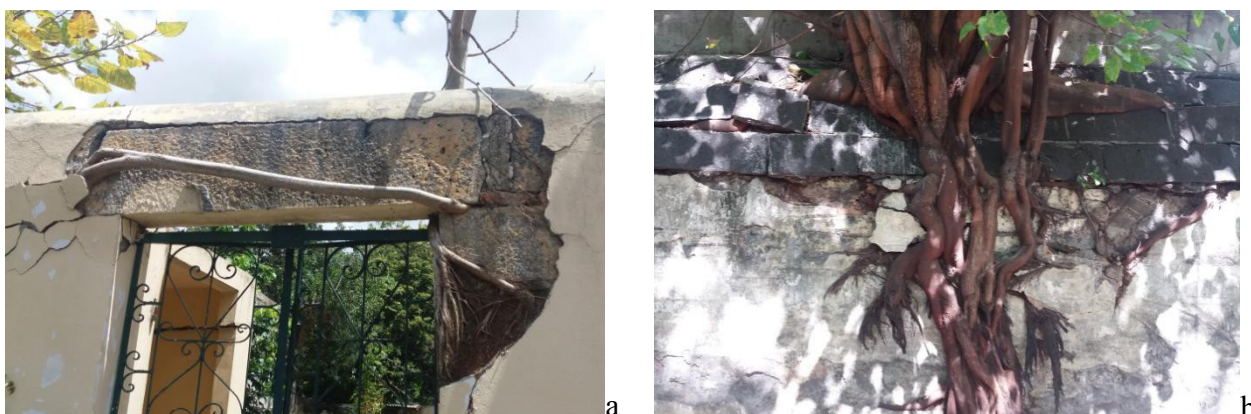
Damages by *Ficus religiosa*: 5a) Wall of a residential building in vicinity of Foucault Street and Deschartes Street (Site 22); 5b) Wall of National Heritage Building at back of Postal Museum Building (Site 13).
